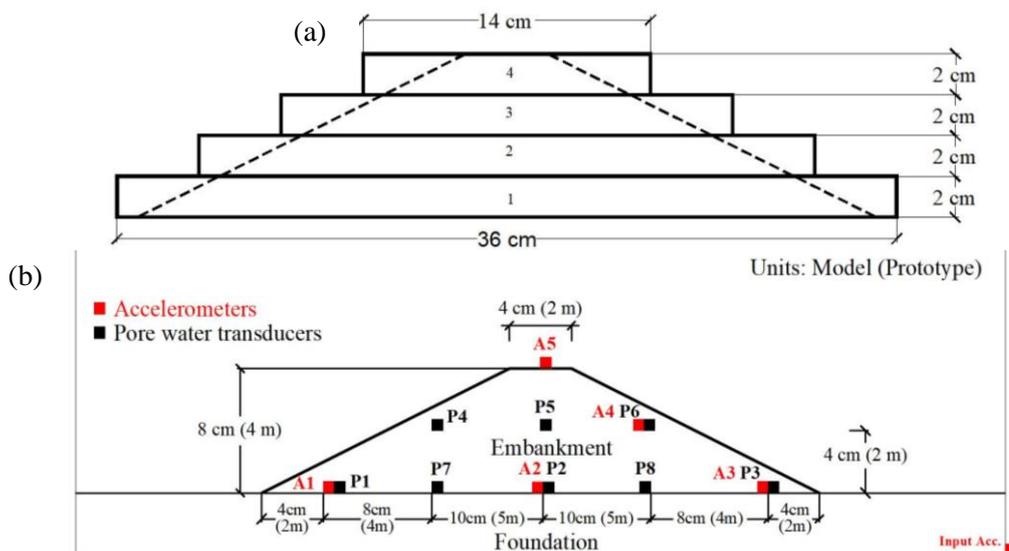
Model set up a) Schematic view of the model before scraping. b) Cross-section view of model with sensors placement
